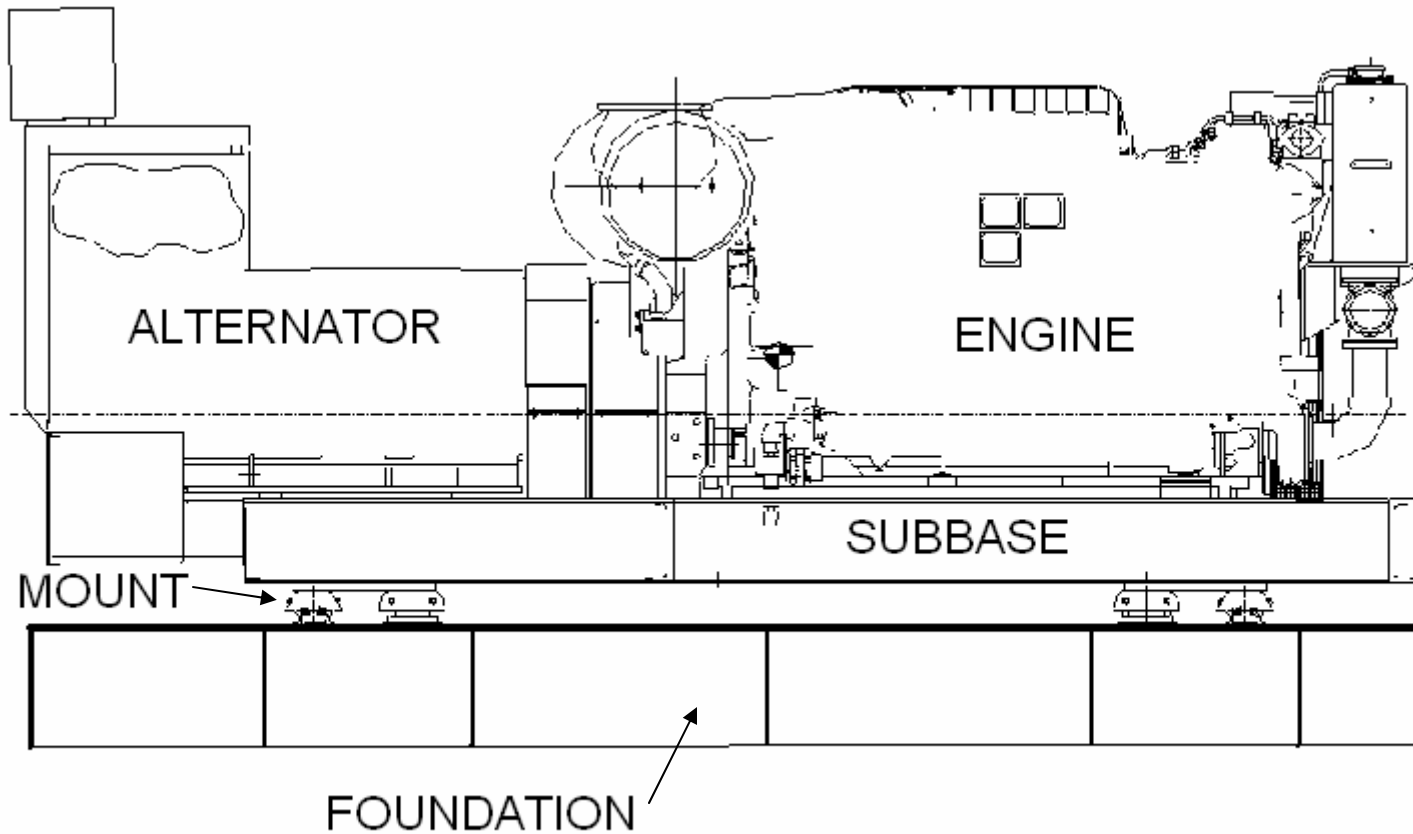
(1): Examples of Resilient Mounts for Machinery
